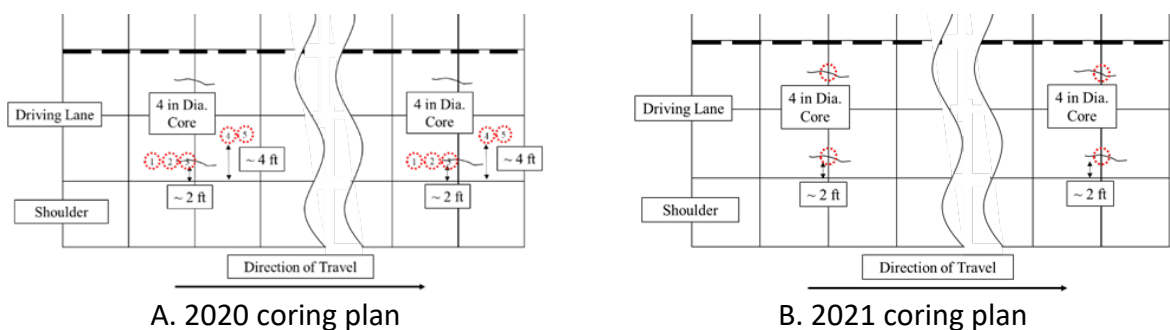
Photos. Proposed coring plan over longitudinal cracking at the transverse joint in (a) 2020 and (b) 2021.
